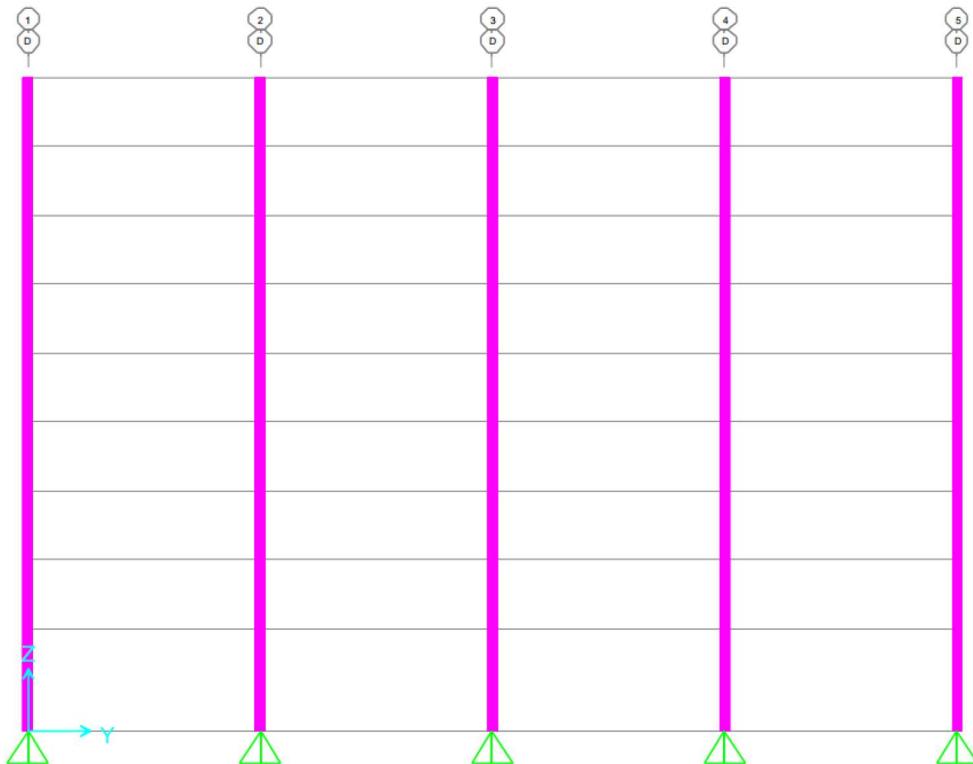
Column cross-section layout in the face D (SAP2000)
